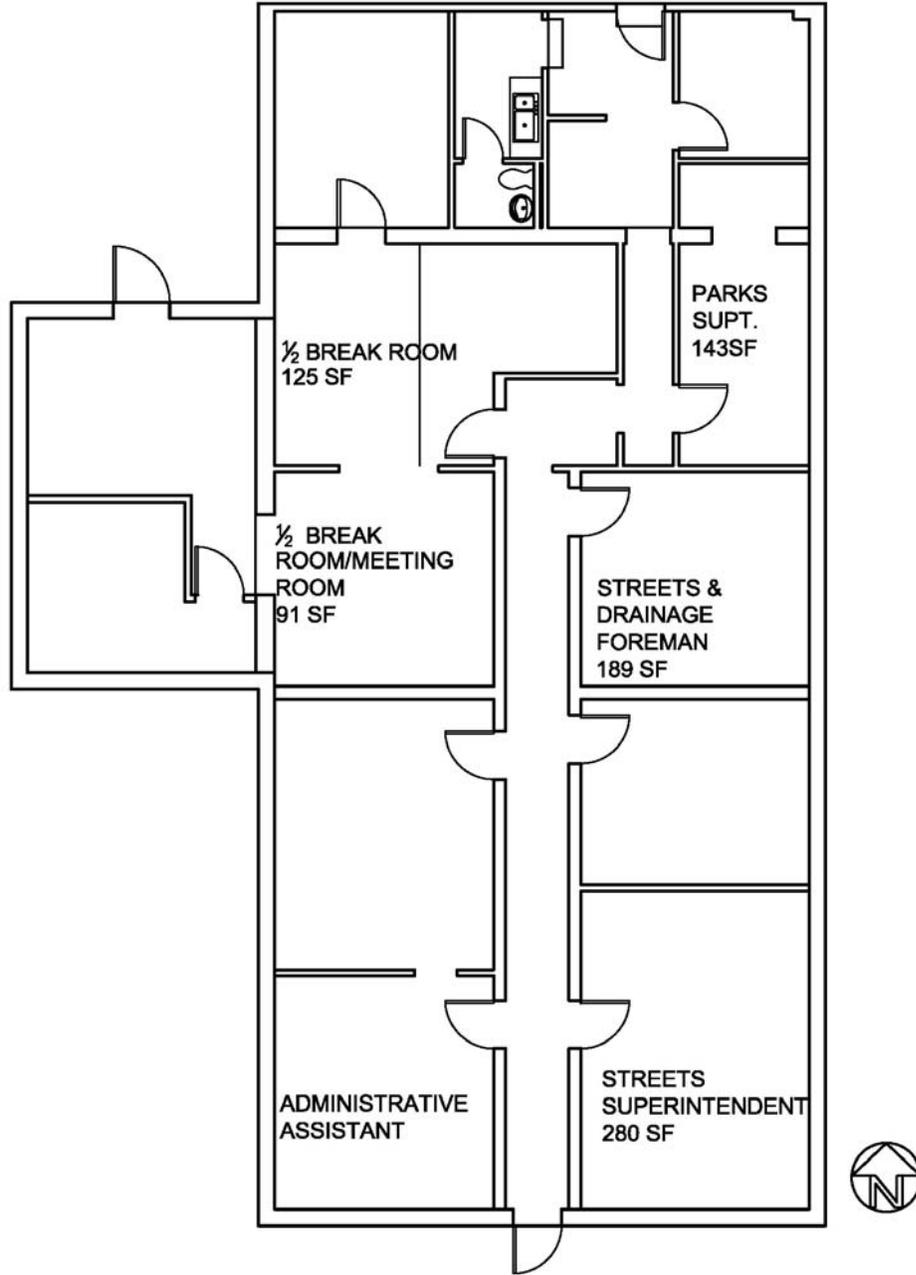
Floor Plan of Shop/Storage Building #2.
